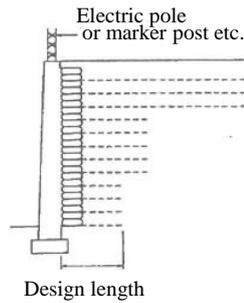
Arrangement of geotextile reinforcement when electric poles are arranged on the top of the facing
